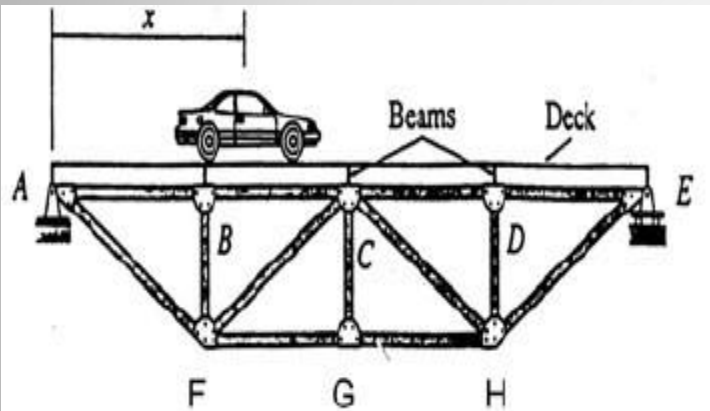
Bridge Truss Structure Subjected to a Variable Position Load
